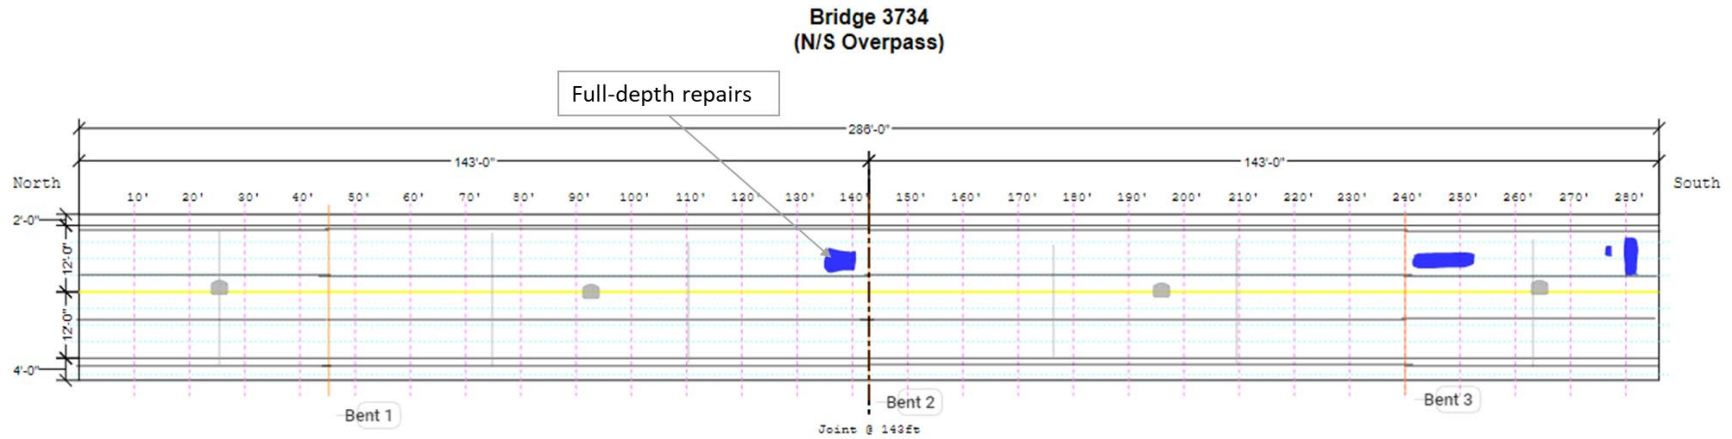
Field notes for Bridge 3734, 2020 inspection, soffit.
